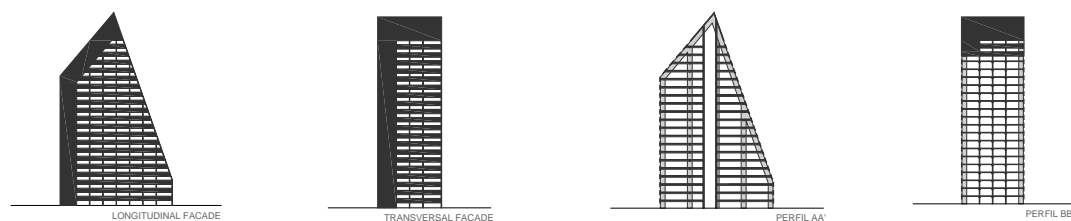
Facades and cross sections of a proposed building using *UT system*.
